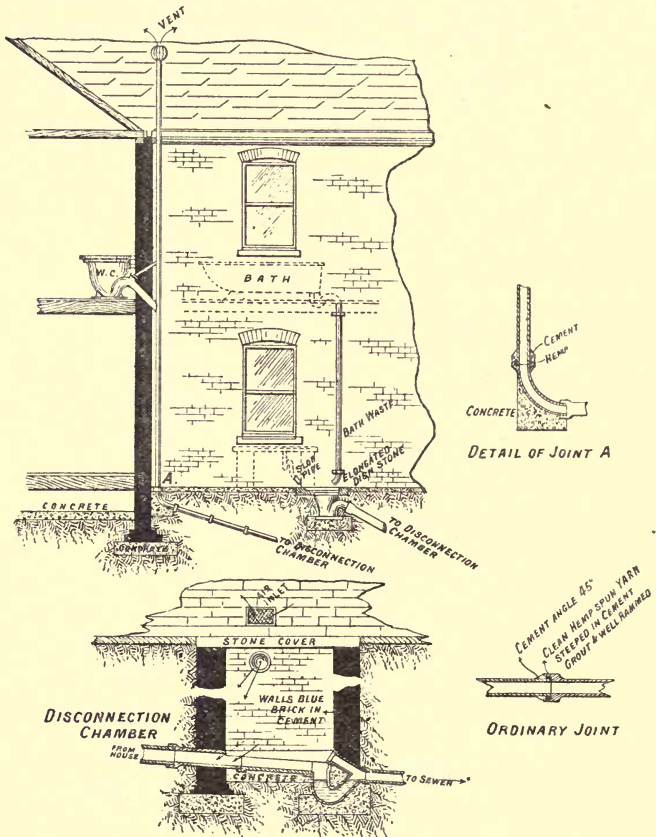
METHOD OF DISCONNECTING HOUSE DRAINS FROM PUBLIC SEWERS.
